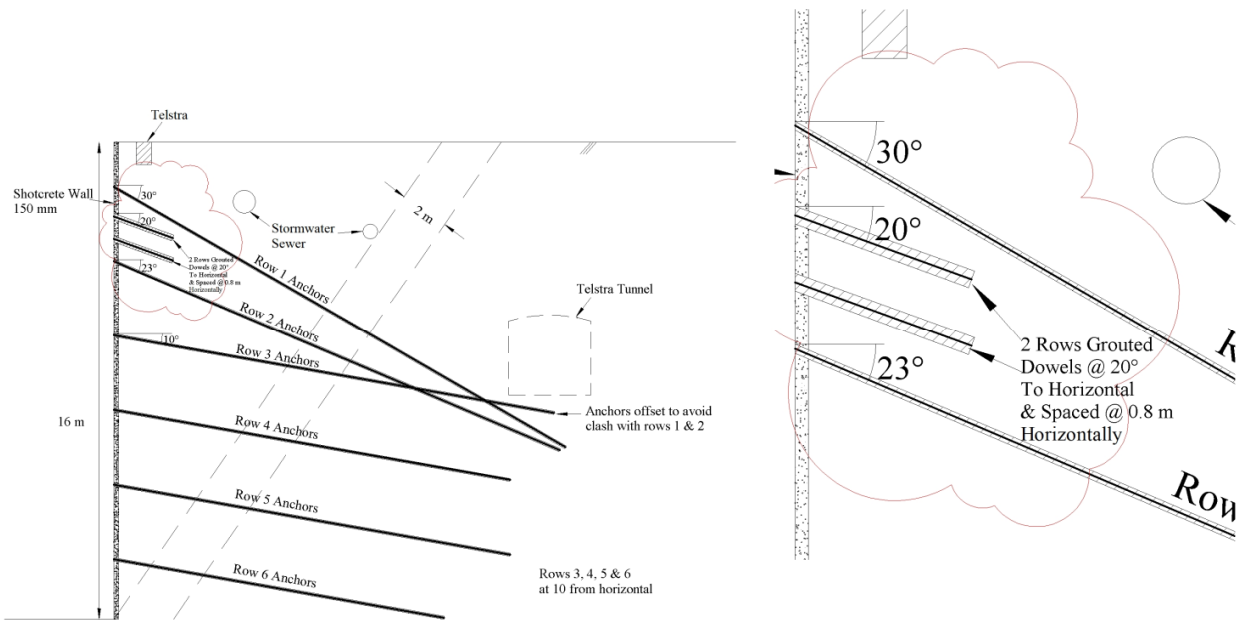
Lonsdale Street East Retention Arrangement to Limit Wall Displacements
